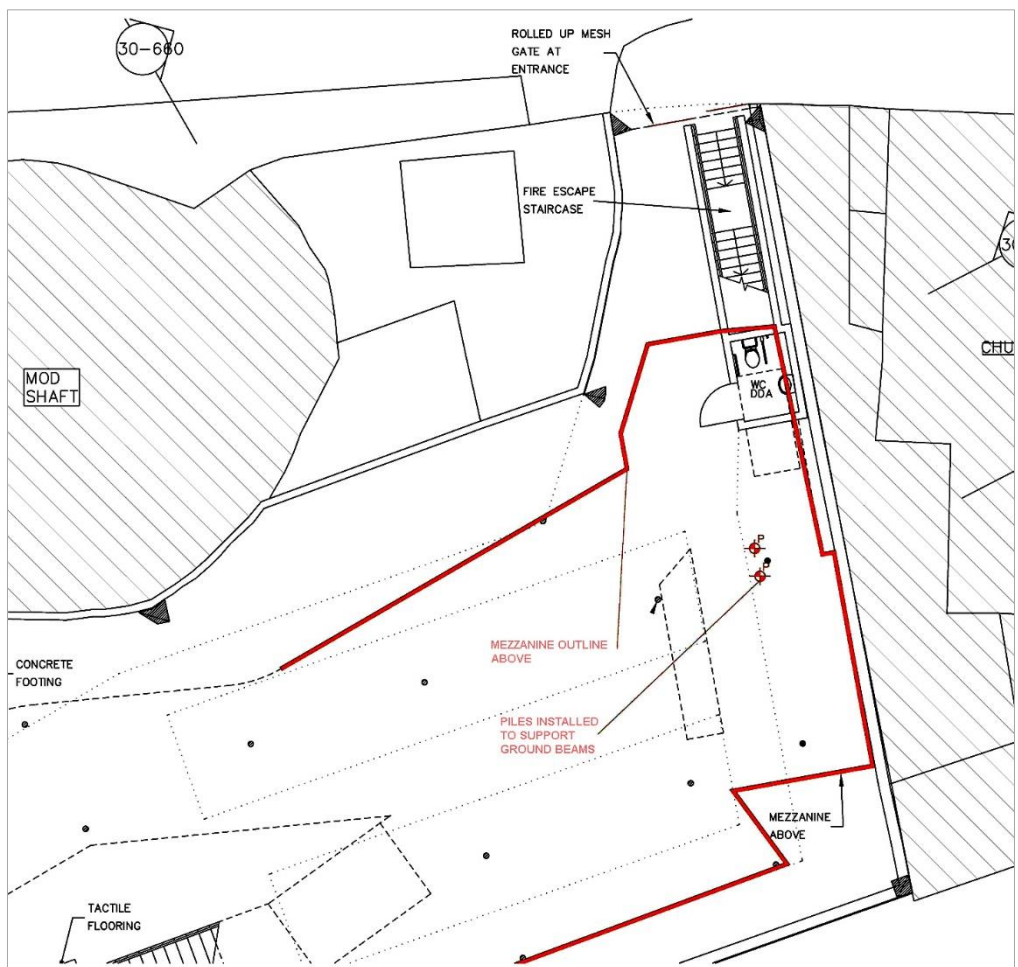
shows pile locations adjacent to perimeter supporting mezzanine above
